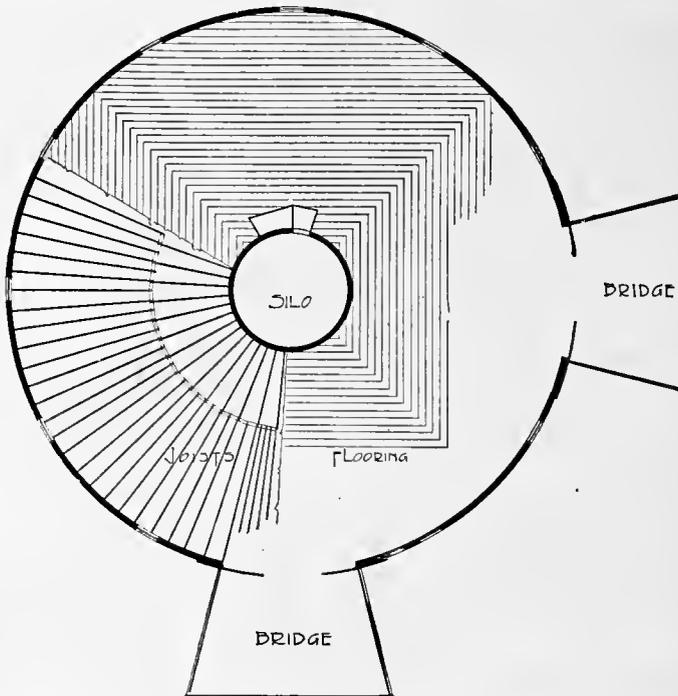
Showing arrangement of joists and how the floor is laid.
